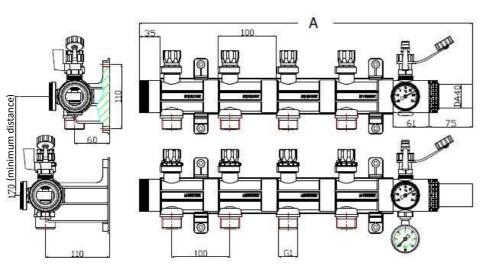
, 4 circuits HP connection with PE welded connection as well as manometer and thermometer accessories
